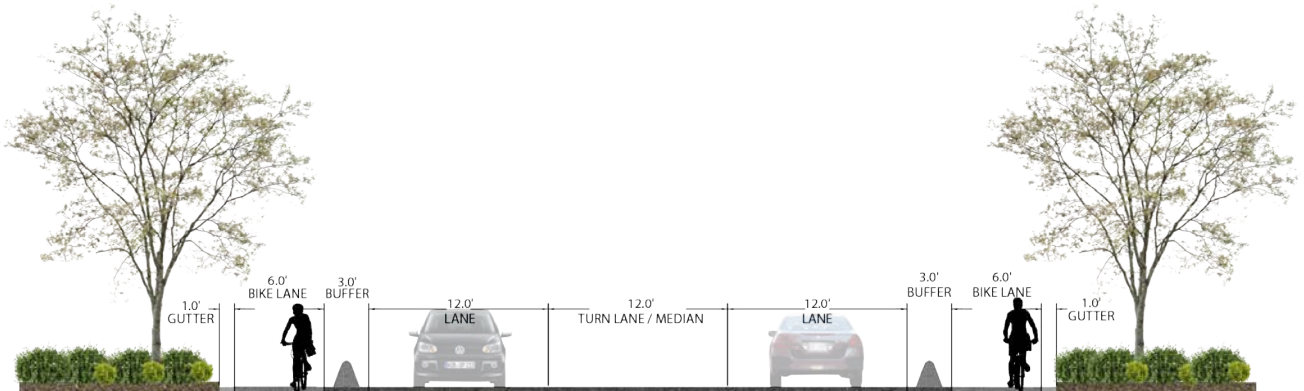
East Jordan Canal Trail typical sections of bike lanes on Creek Rd from Union Park Ave to Aspire Surgical.
